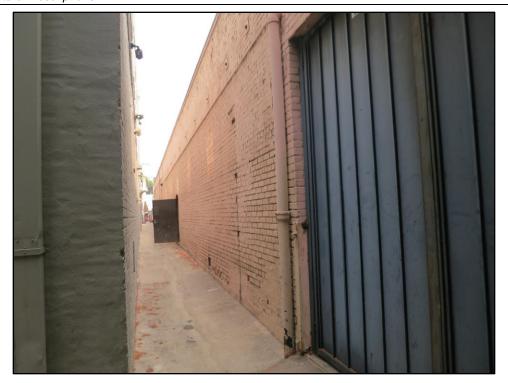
Detail of south door on west façade of Gilbert Garage, looking north.
